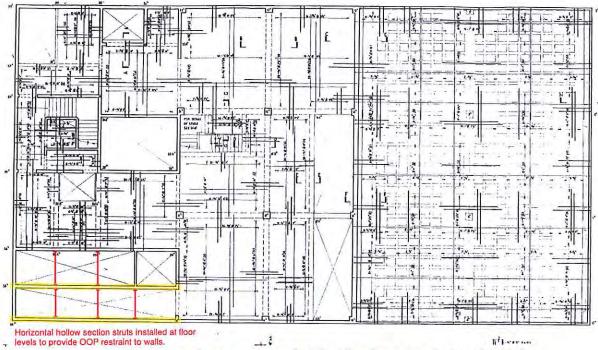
Typical floor plan showing proposed strengthening to upgrade out-of-plane deficiency to walls as highlighted
